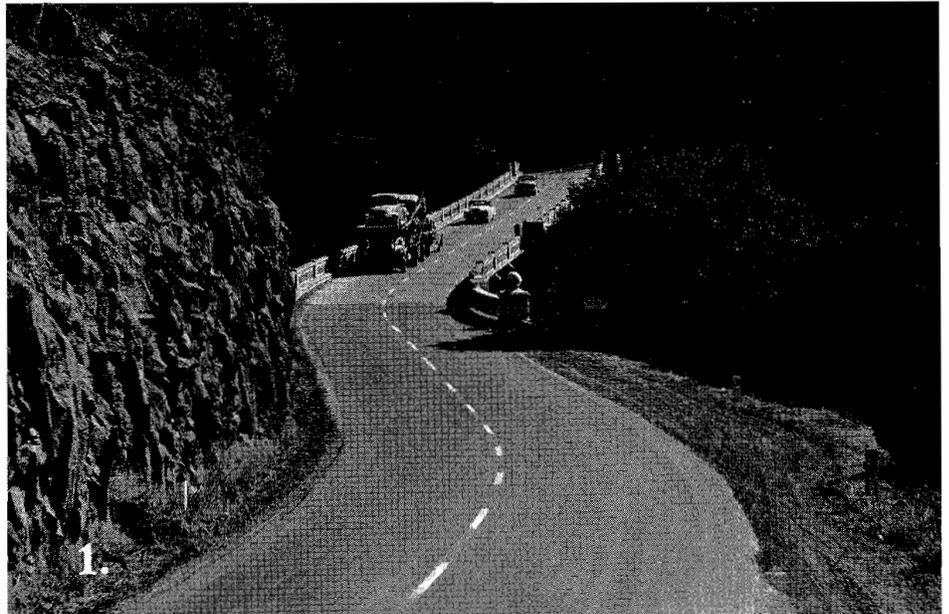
shows the old Dog Creek Bridge with its poor approach alignment.
